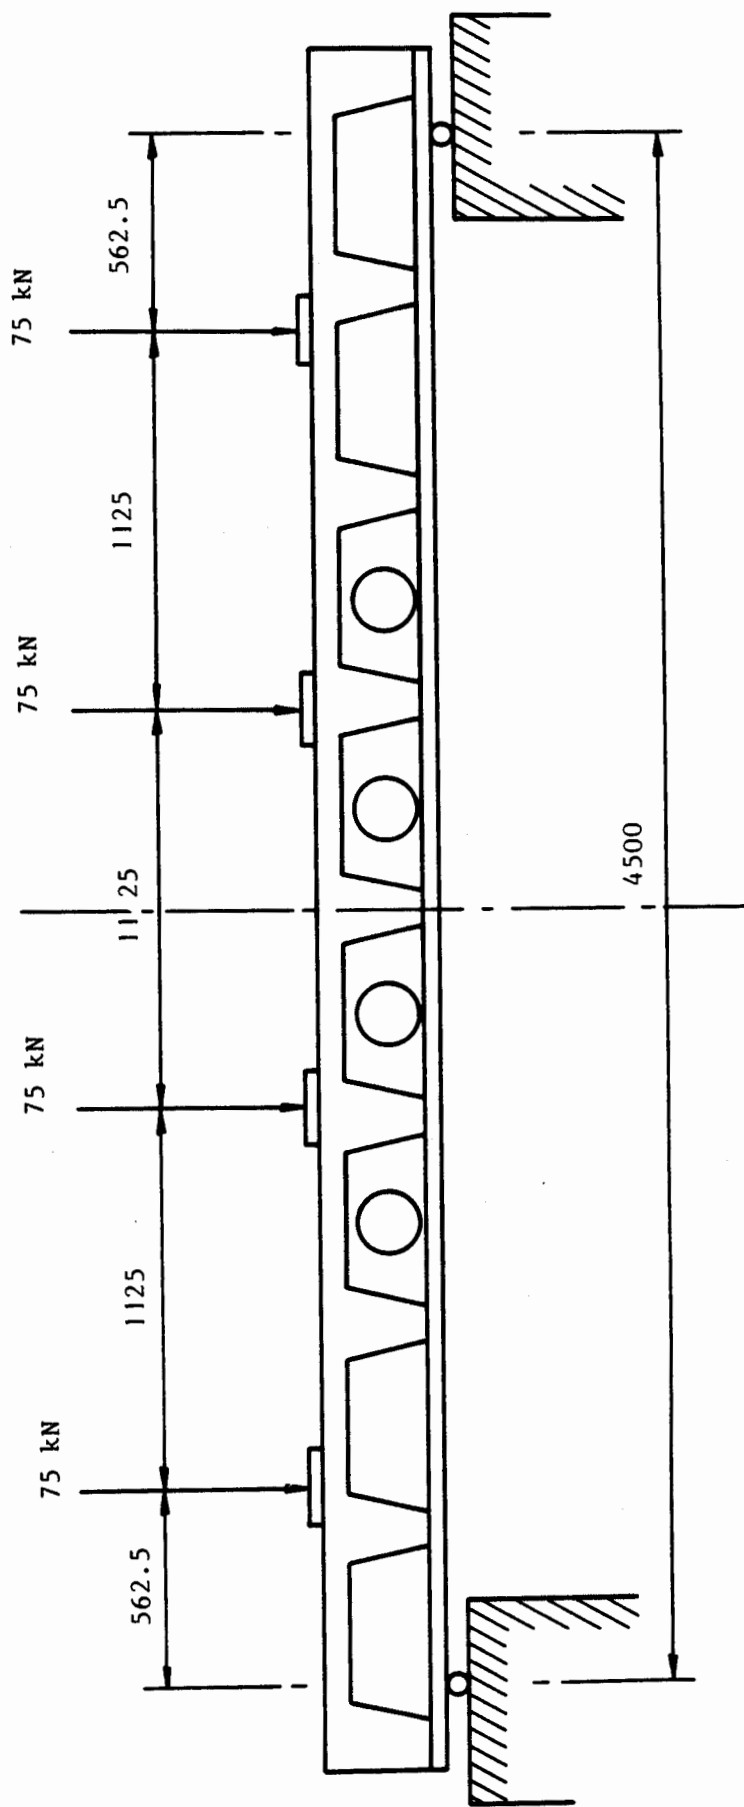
APPLIED LOAD POSITIONS - LONGITUDINAL ARRANGEMENT - TEST NO. WFRC 56867 (R4/57)
